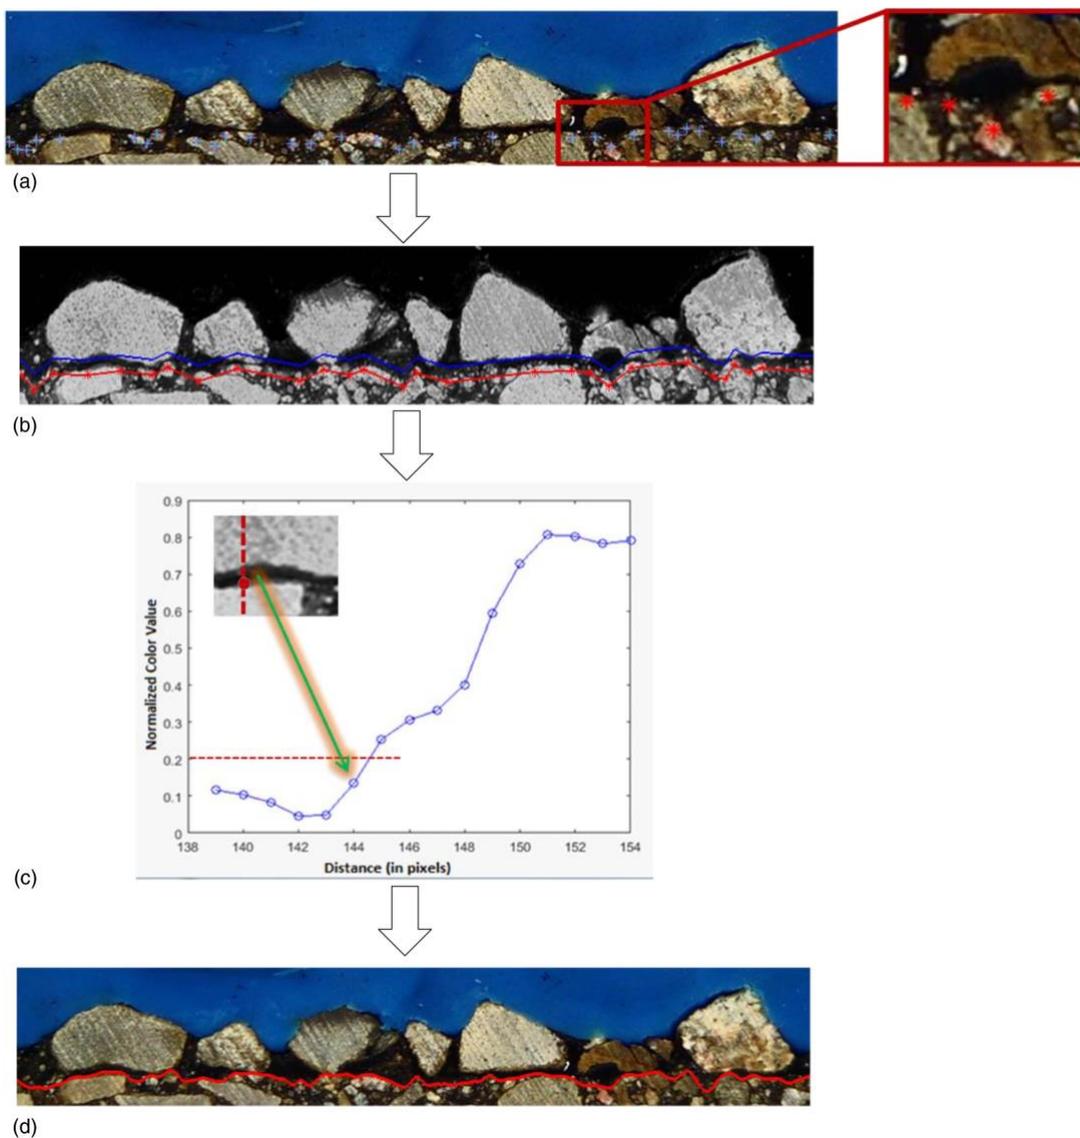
Steps of Determining Existing Pavement (Ozdemir et al.)
